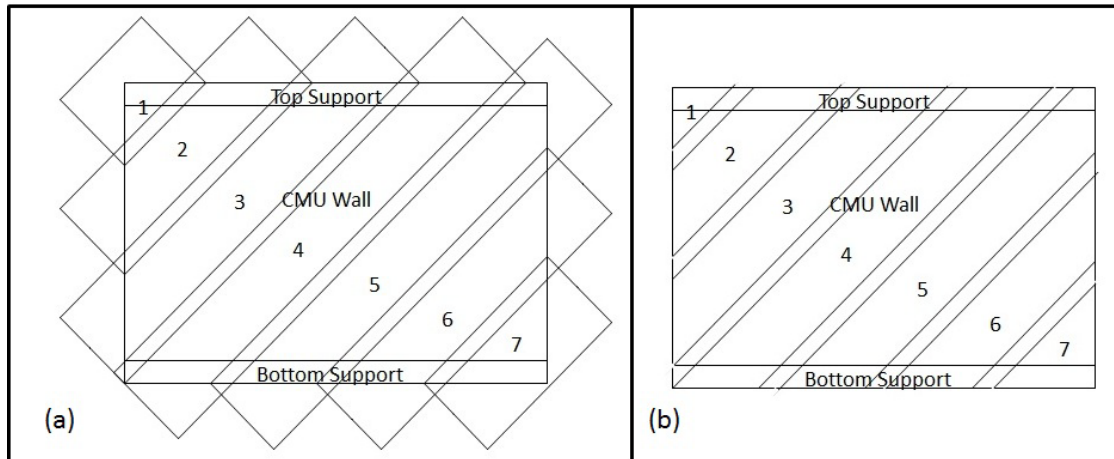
Fabric orientation. (a) The fiber reinforcement layout. (b) Fabric coverage after sheets were trimmed to fit wall.
